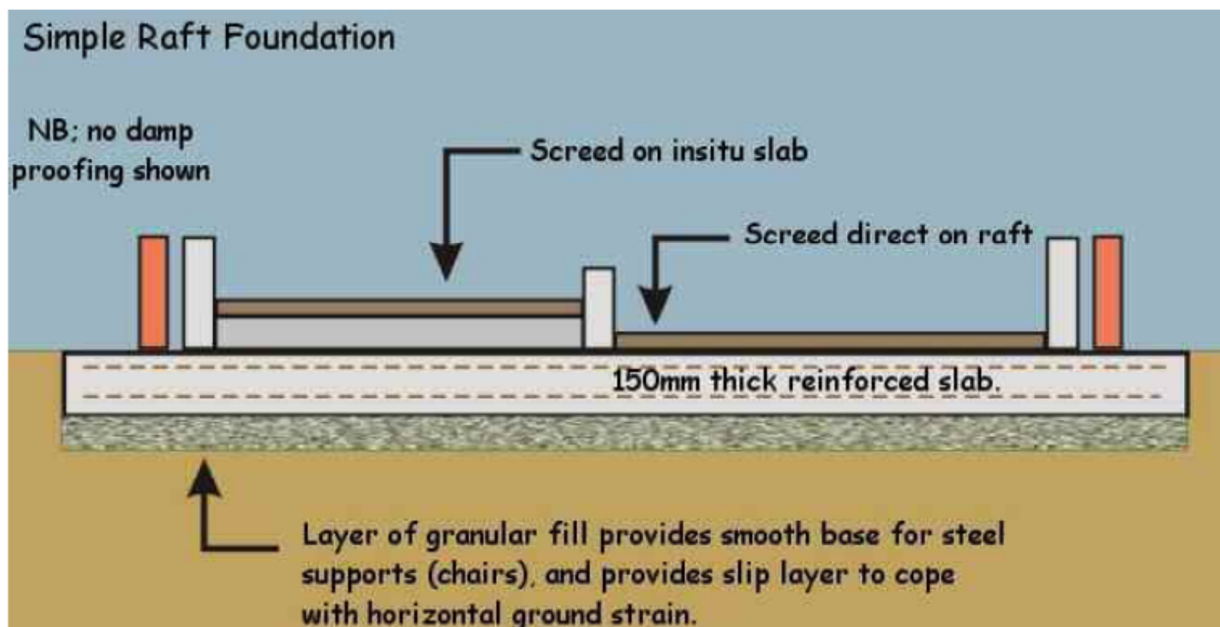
Simple Raft foundation (<http://www.bne.uwe.ac.uk>)
